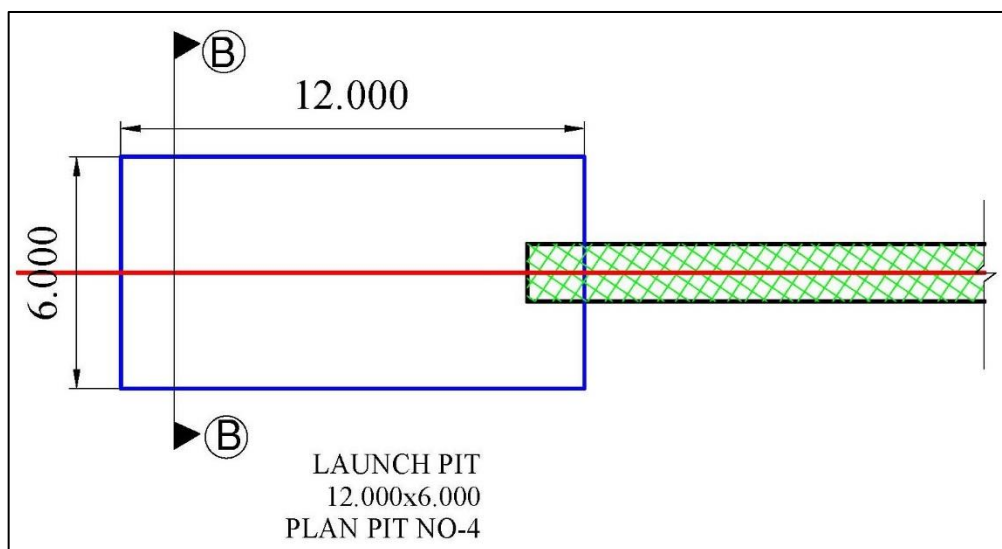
Plan at launching pit for micro-tunnelling M09 & 10
